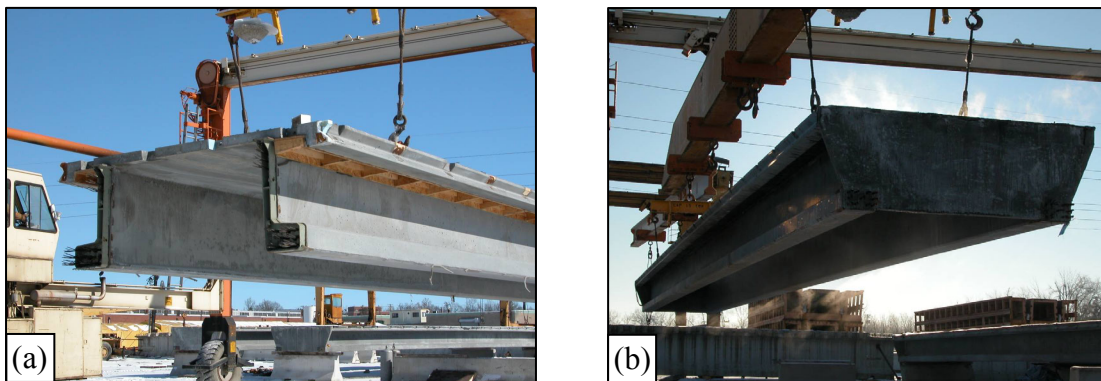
(a) Girder After Stressing and (b) Girder Ready for Transport.
